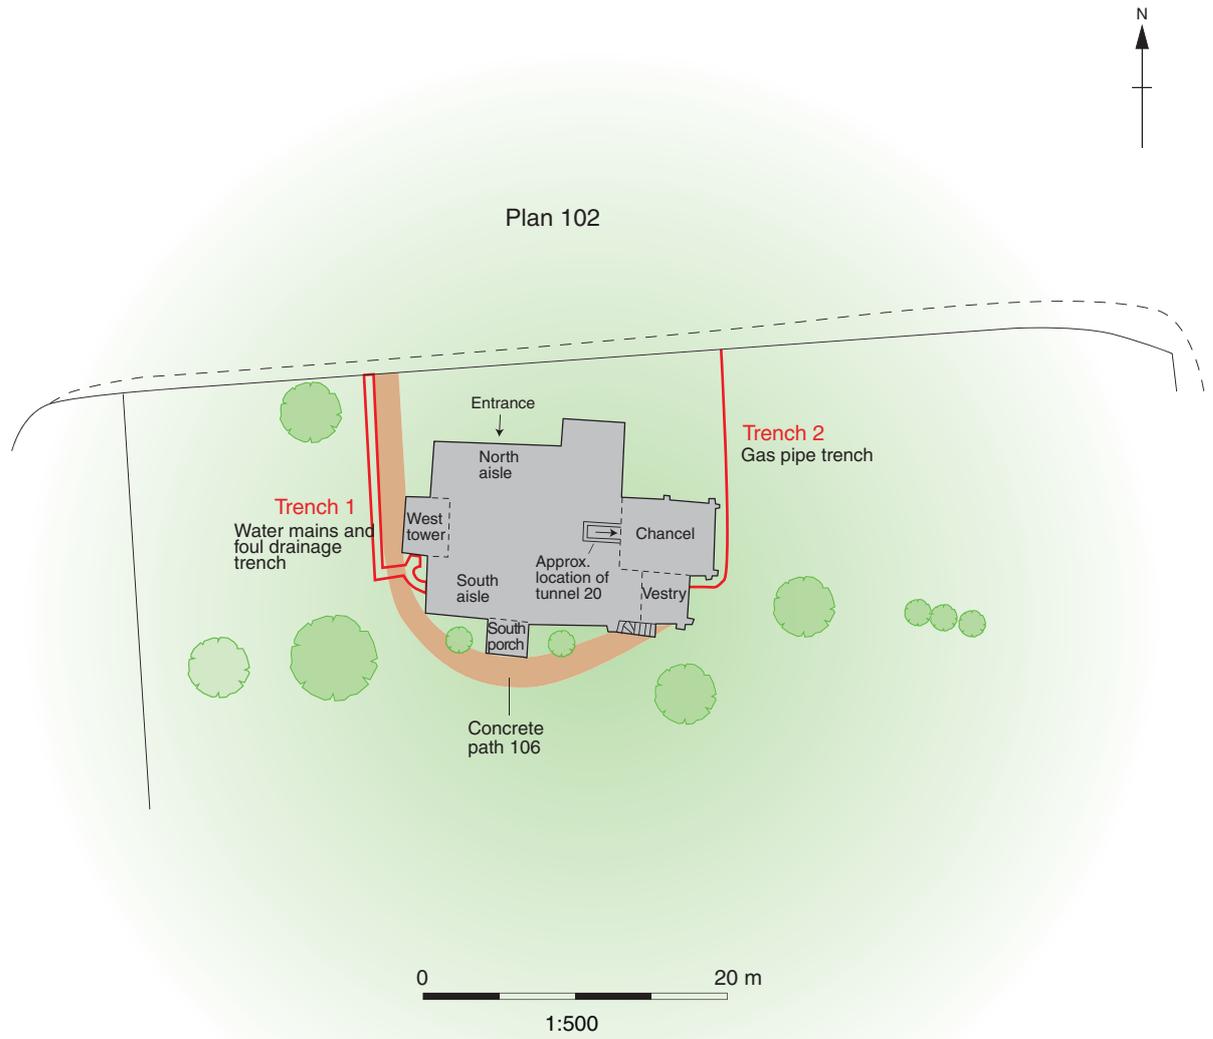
Plan showing church and approximate locations of service trenches and tunnel 20
